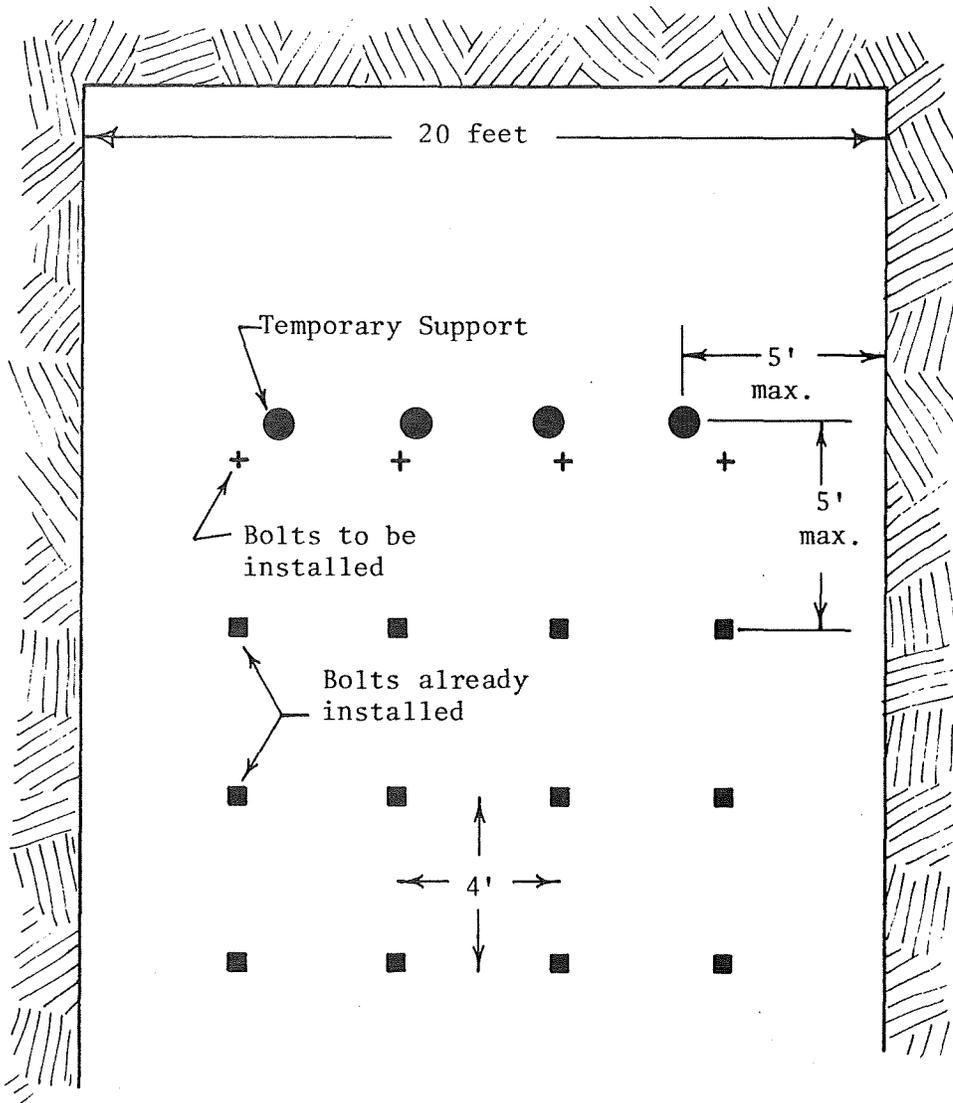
Typical Face/Entry Roof Bolting Pattern
